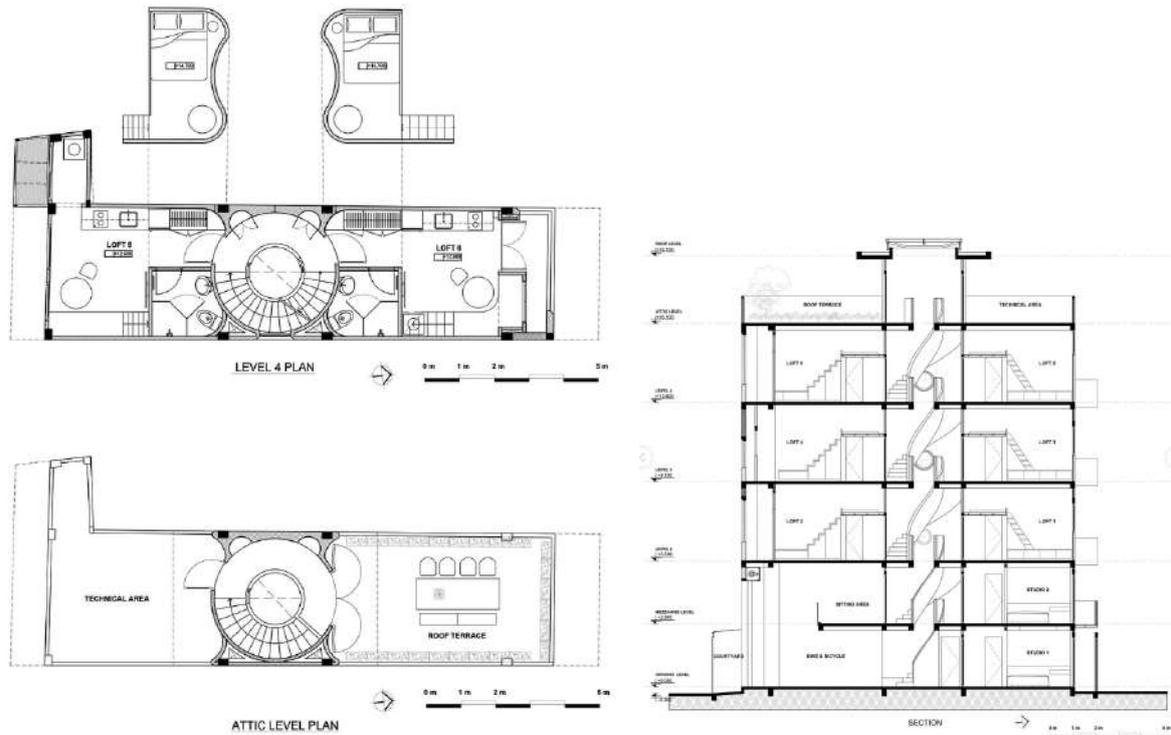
Floor plans (source: <https://www.archdaily.com/1029769/cloud-house-room-plus-design-and-build>)
